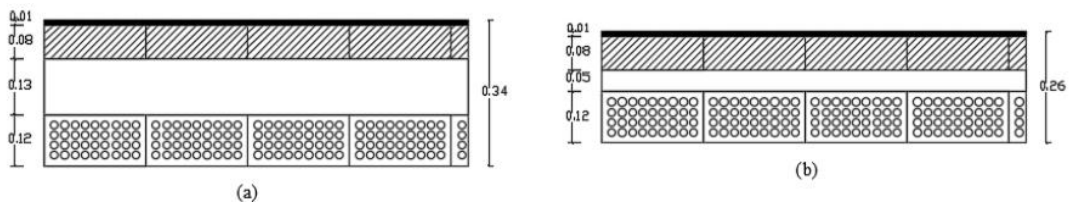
Masonry walls of the external frames: walls of the first interstorey (a), walls of the higher levels (b). Dimensions in meters [m]
